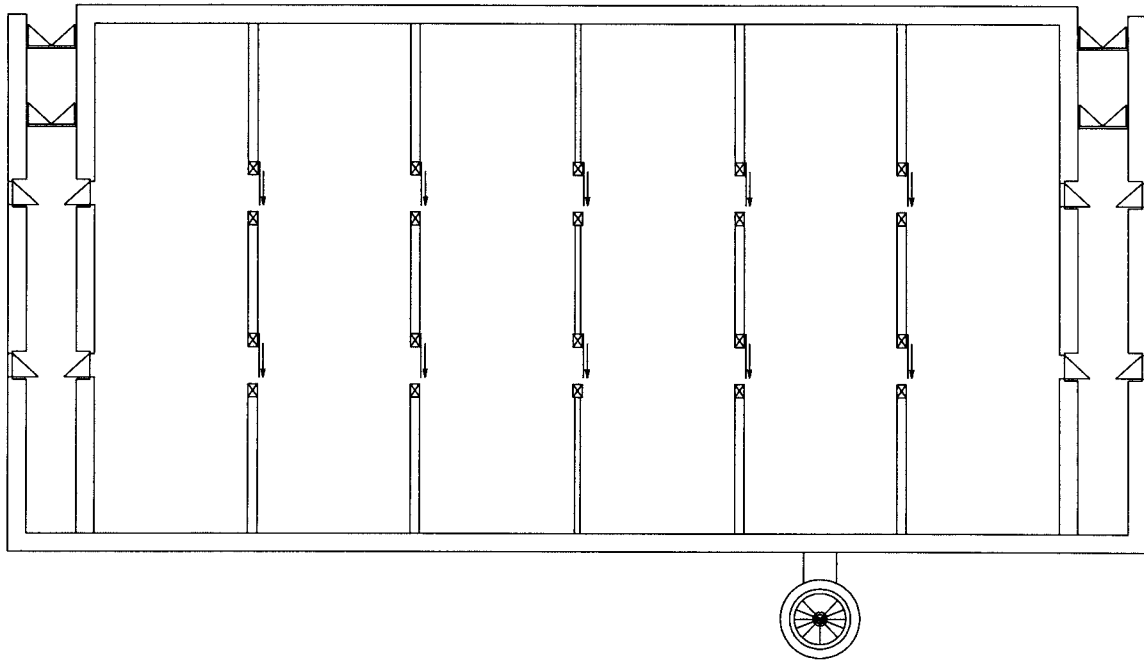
A storeroom at the Regional Archive of Schleswig-Holstein. The storerooms are split into six sections parted by masonry walls and sliding doors. Notice the access area with the air locks.
